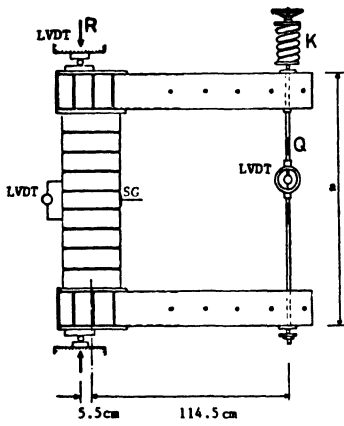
TEST SETUP FOR PRISM ECCENTRIC COMPRESSION TESTS
